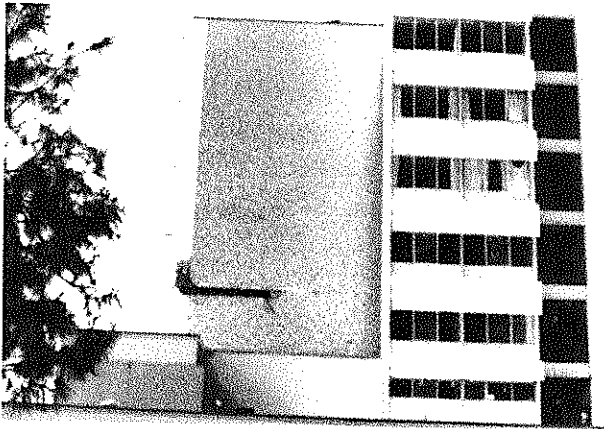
Concrete in the floor slab was considerably weaker than that in the shear wall and failed by crushing. Post Unsafe.
